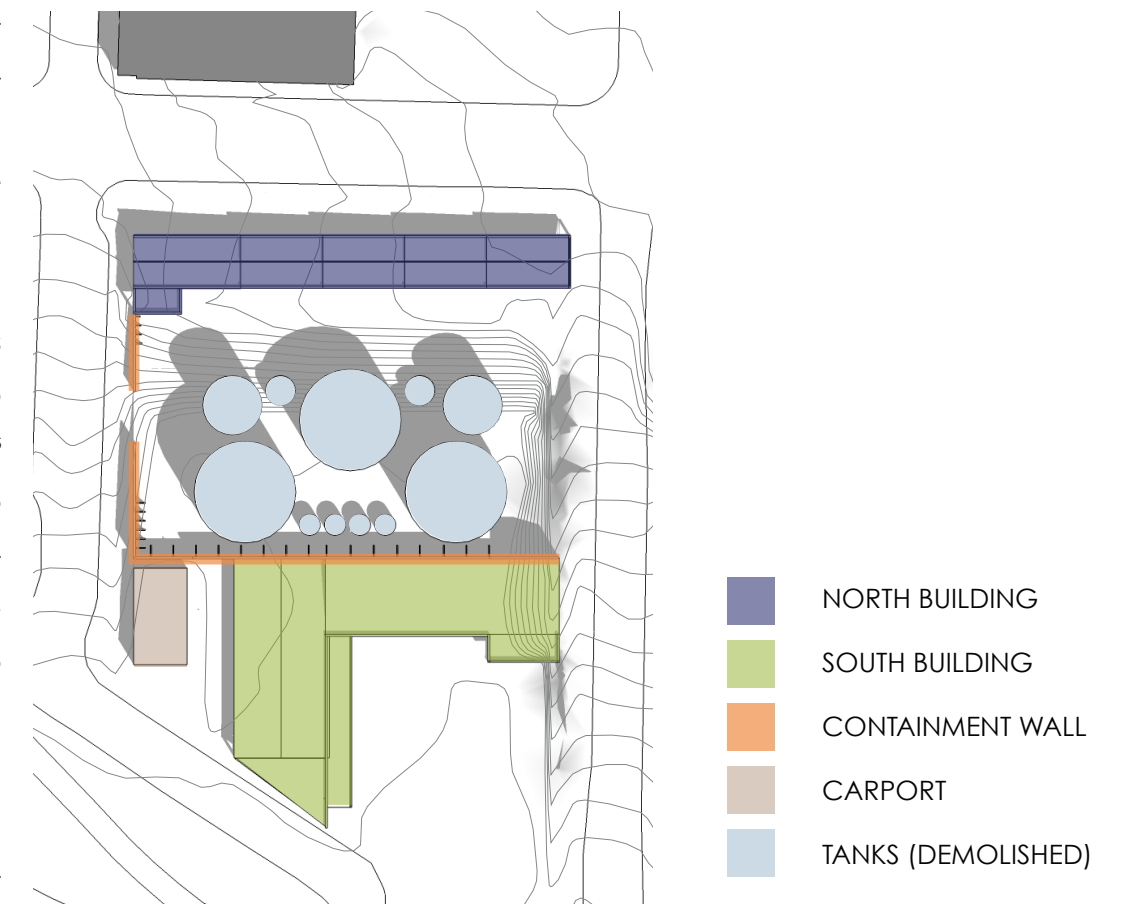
The original site plan of the Standard Oil facility, 1927-1999. Image: Historic Landmark Nomination Form
